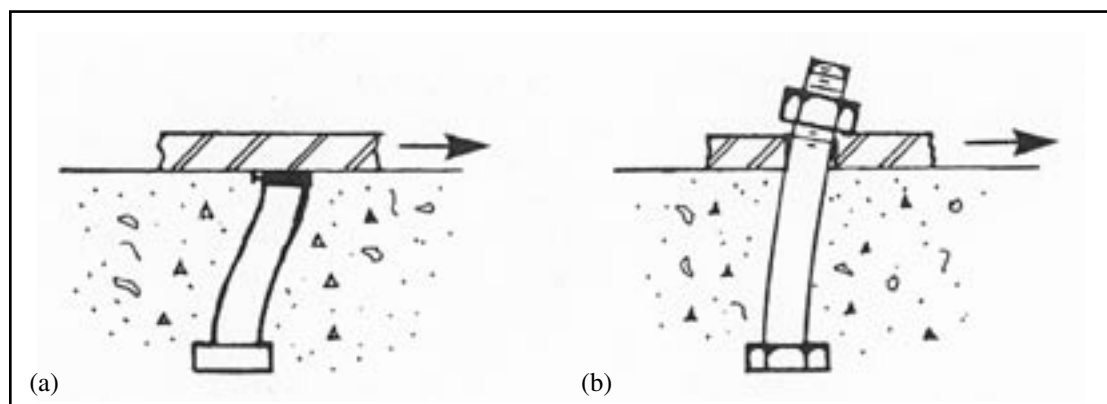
End fixity conditions at the connection plate:⁹ (a) Headed stud weld produces a fixed condition; (b) Post-installed anchor in a hole allows rotation, making a pinned condition.
